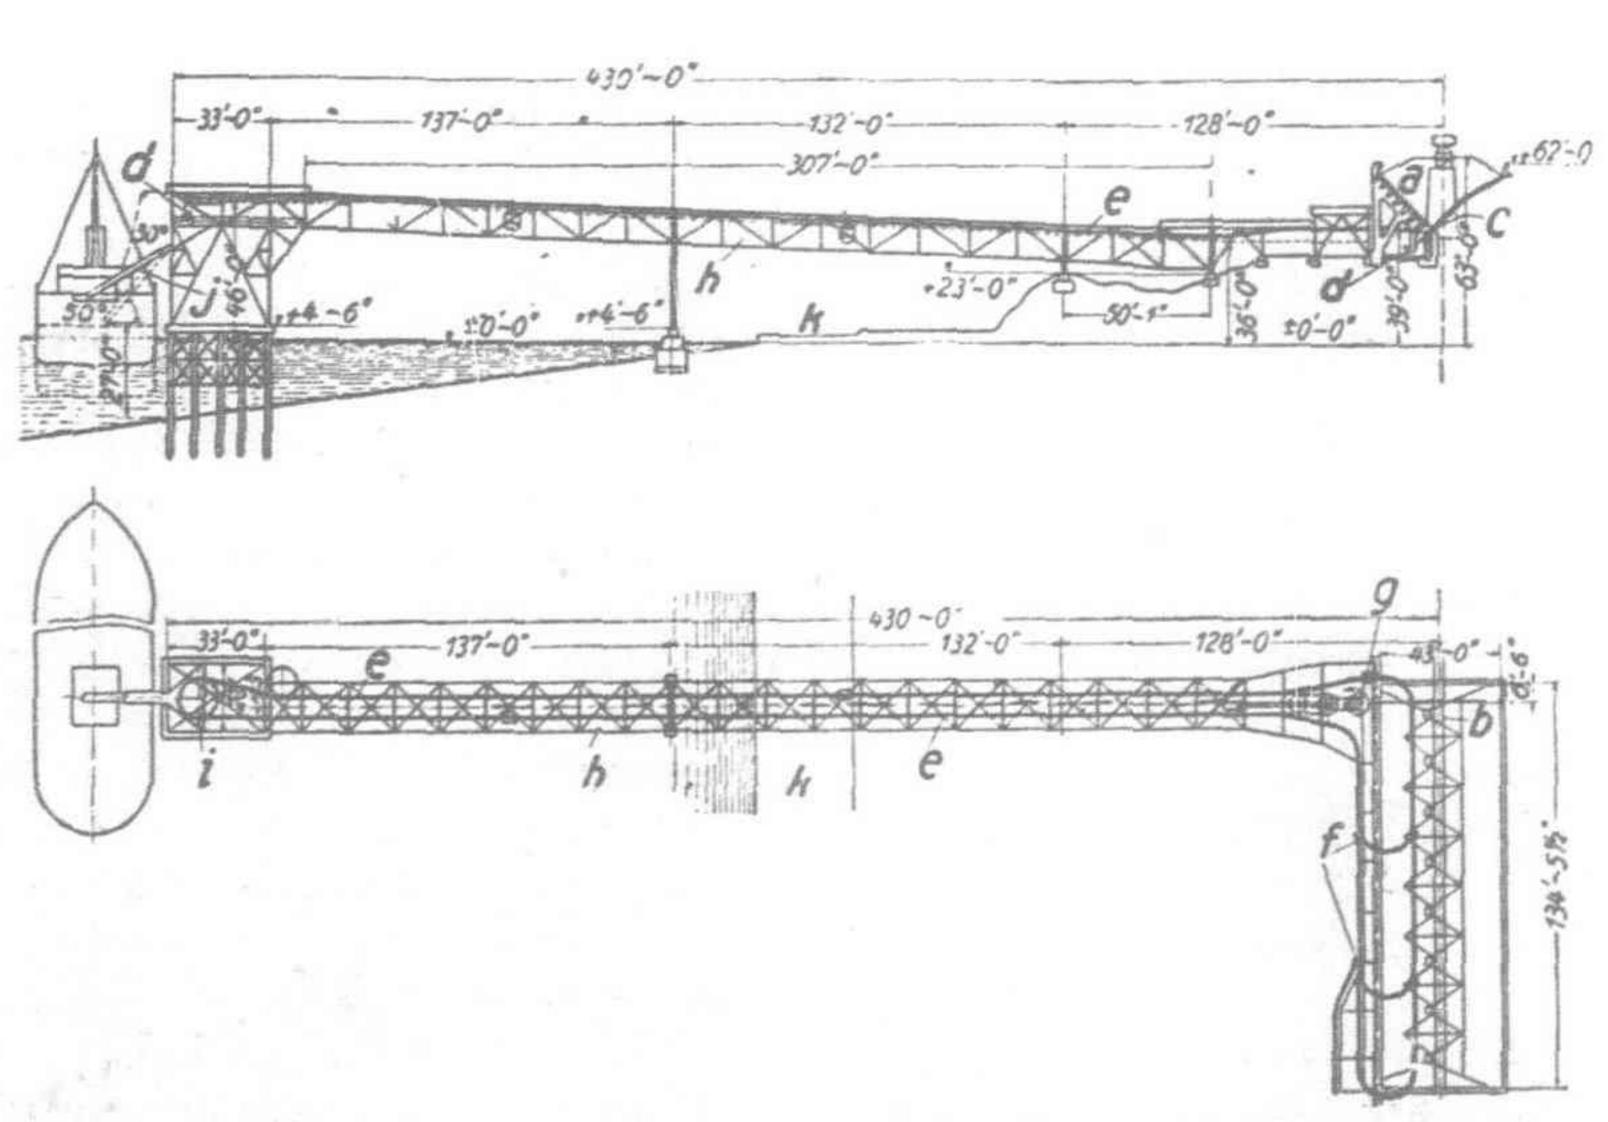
Plant and Elevation of Shiploading Plant in the Harbor of Shako, Korea
